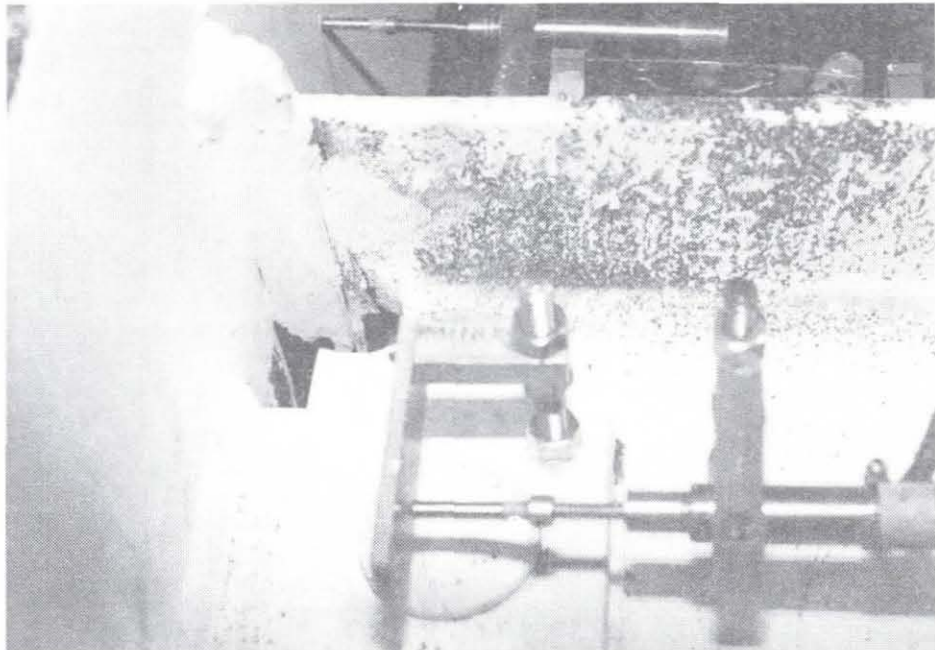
Beam Top Flange Cracked at The Center (Specimen 18)
